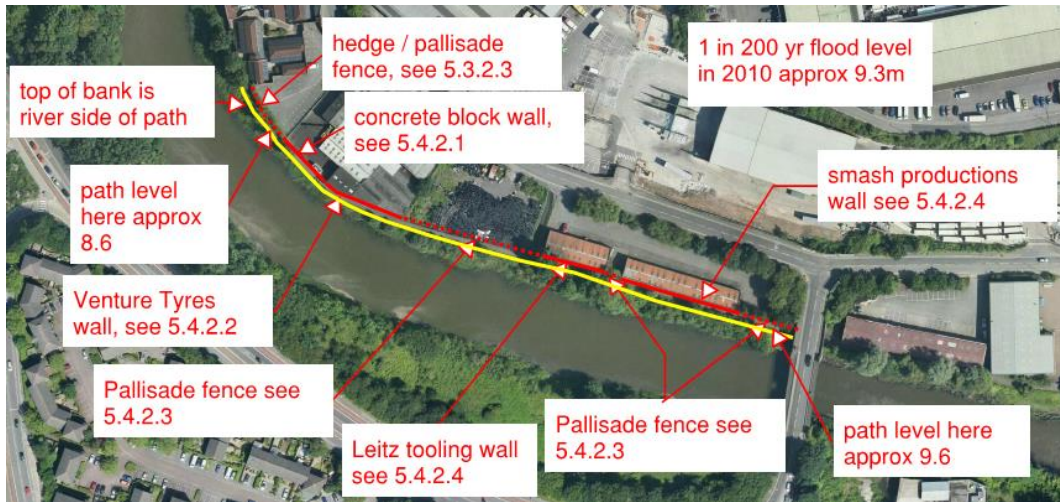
Walls from RSPCA Bristol Dogs and Cats Home to Albert Road Bridge, aerial image © Blom 2012
